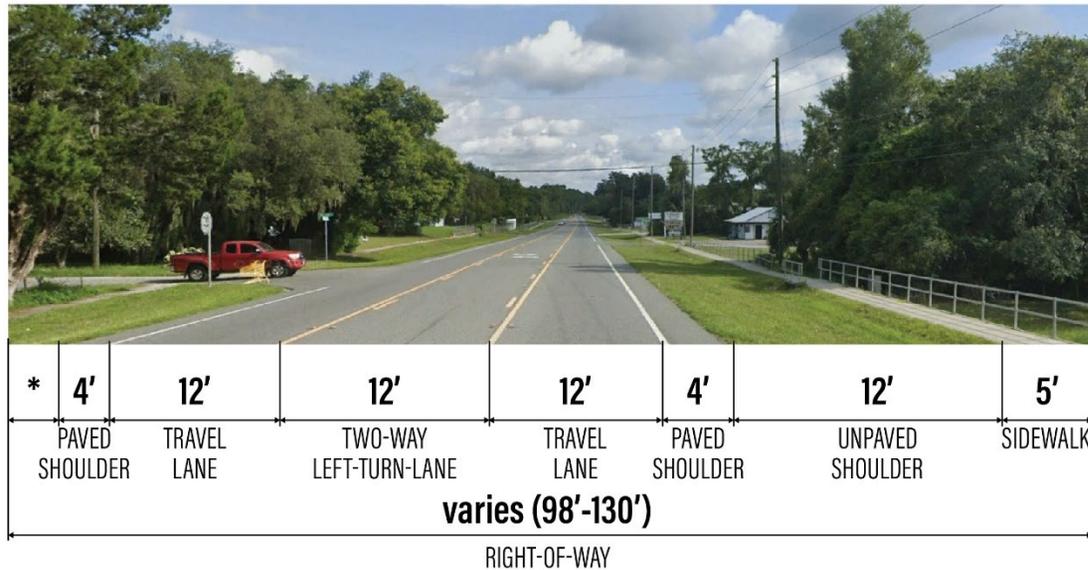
Existing Typical Section Facing North (segment with TWLTL)
